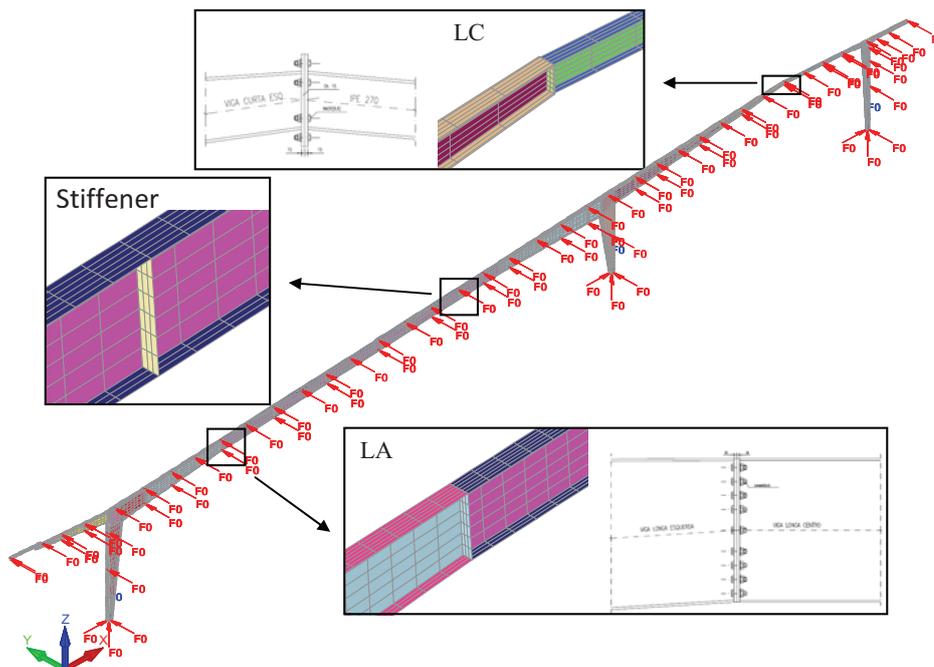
Model restrictions and details of the beam to beam connections and of a transverse stiffener
